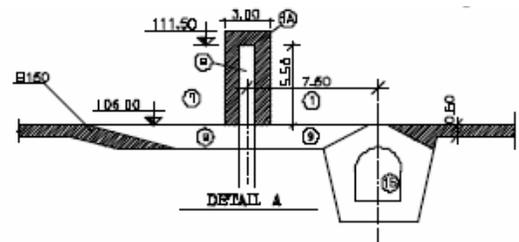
Cross section of Karkkeh storage dam (Mahab Ghodss Consulting Engineers, 1995)
